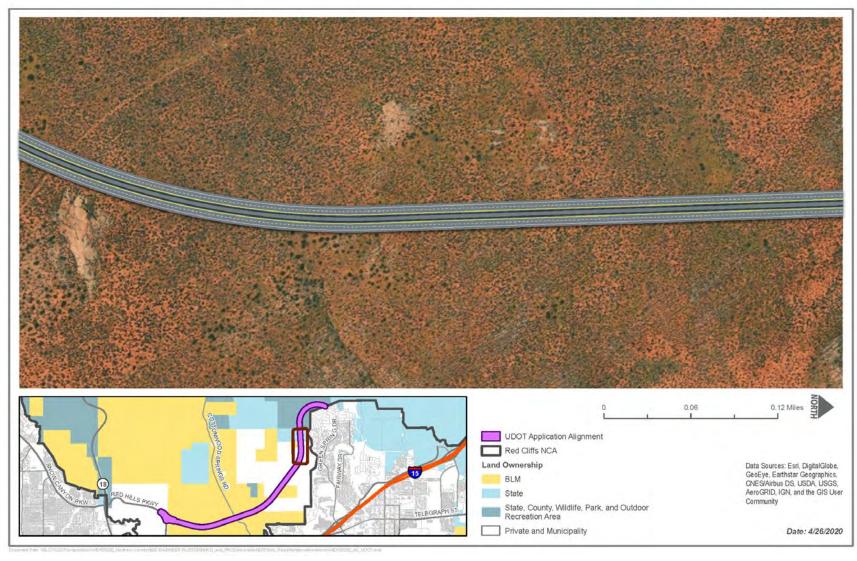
UDOT Application Alignment Plan View (7 of 9)
